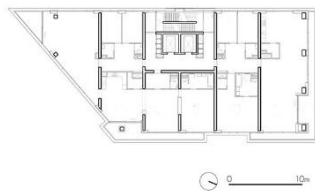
18th Floor Plan of Haut (Url-1, 2024).
